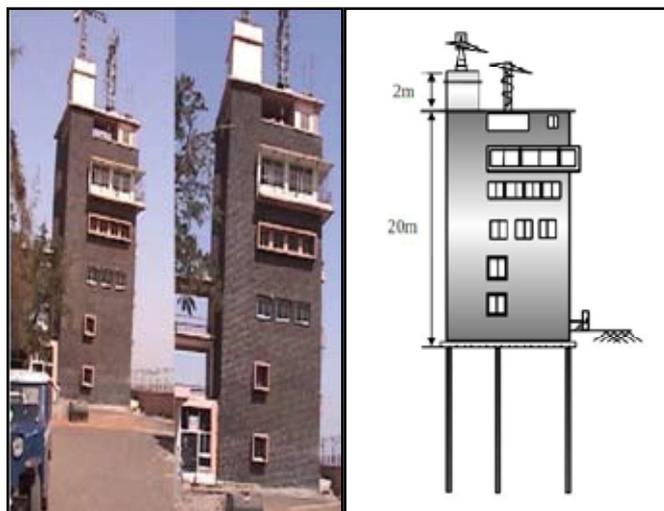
(a) Elevation of Port Building and (b) Column Details of Port Building
